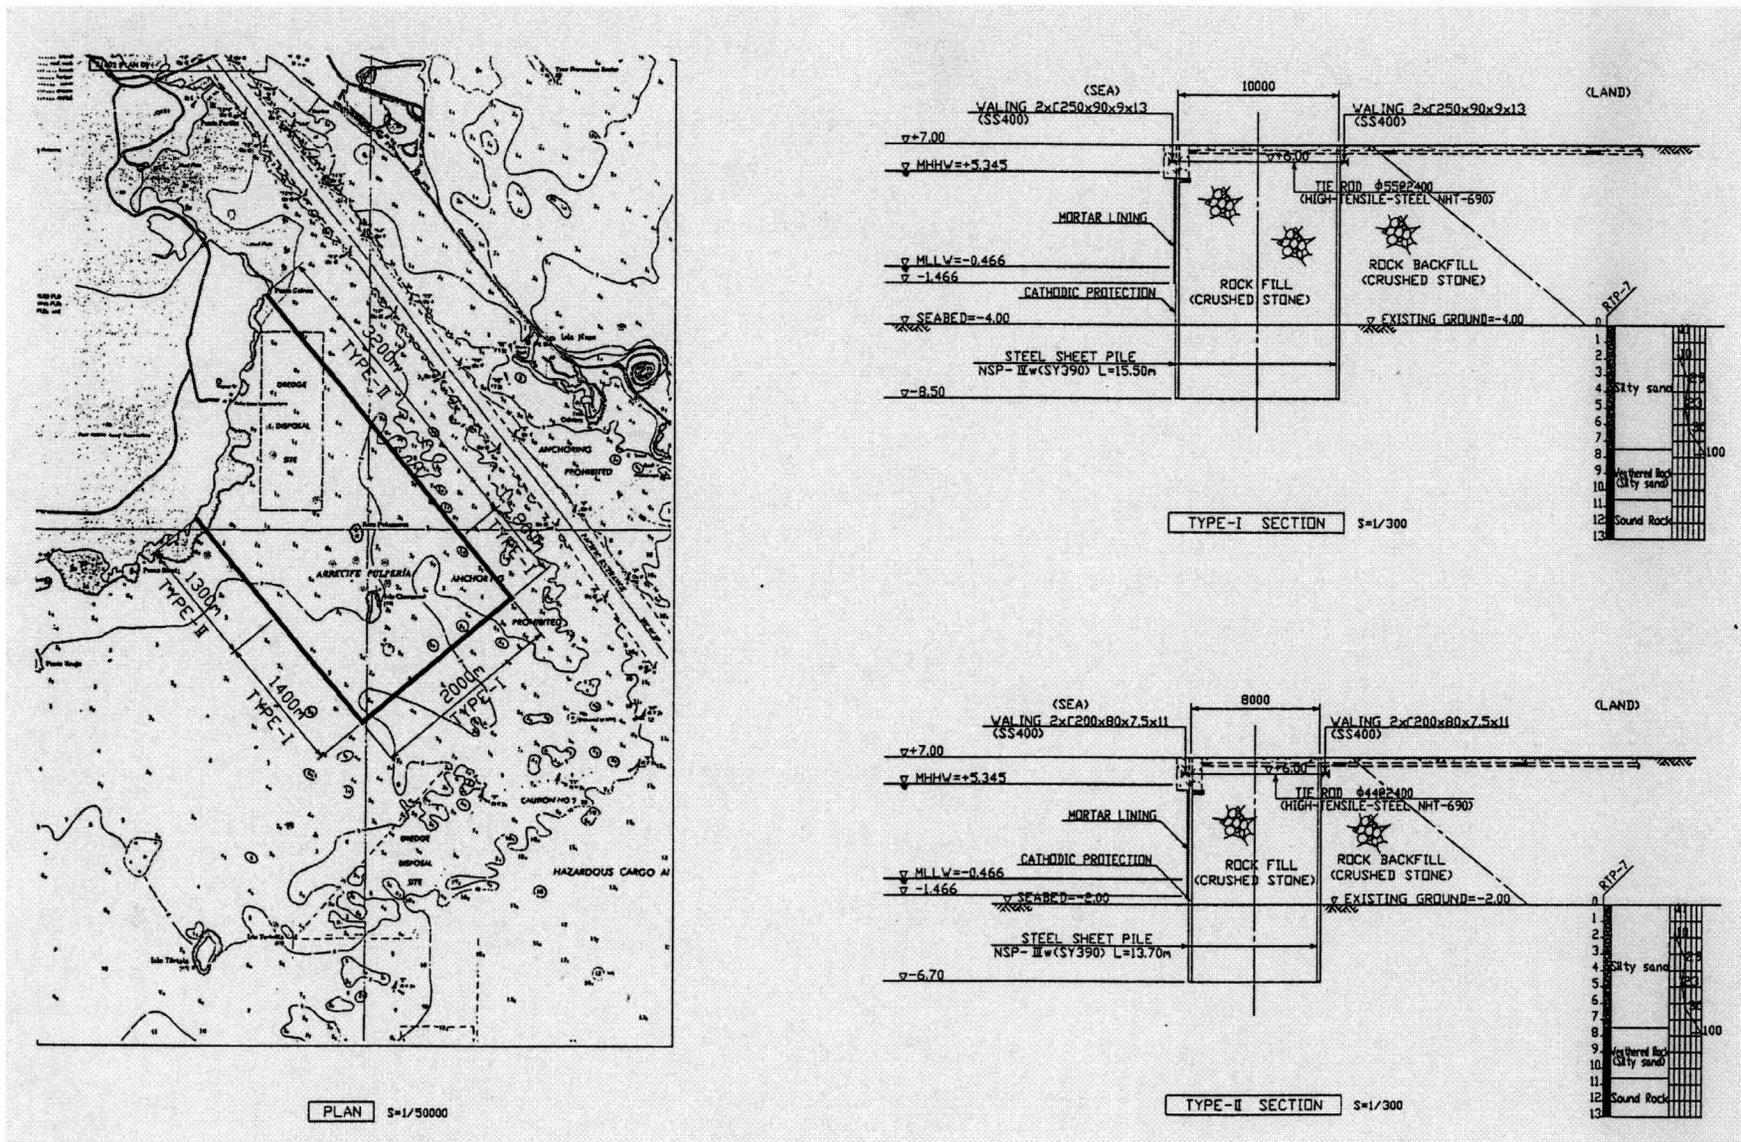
Layout Plan and Section of Double Sheet Pile Wall in Peninsula
